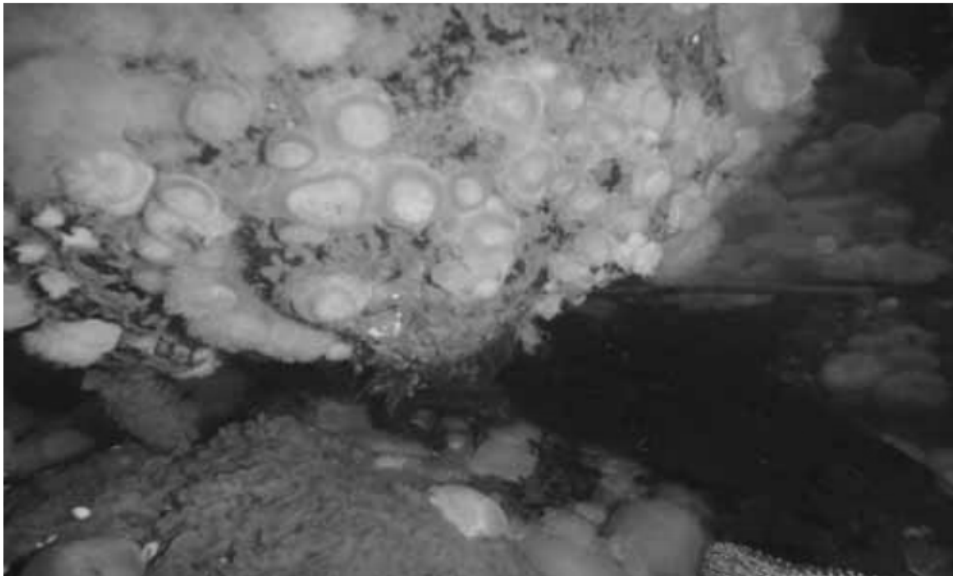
Canal Bridge No. 6880 - Pile No. 10 on Pier No. 8 is not in bearing.
